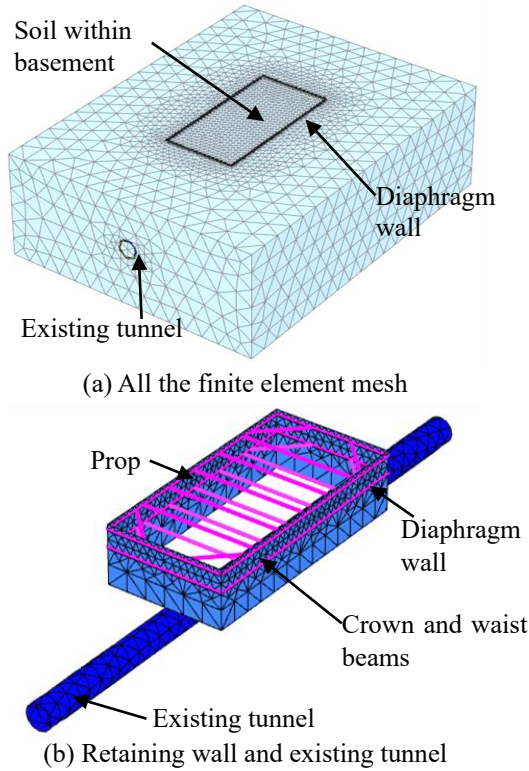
Three-dimensional numerical mesh of basement excavation above an existing tunnel
